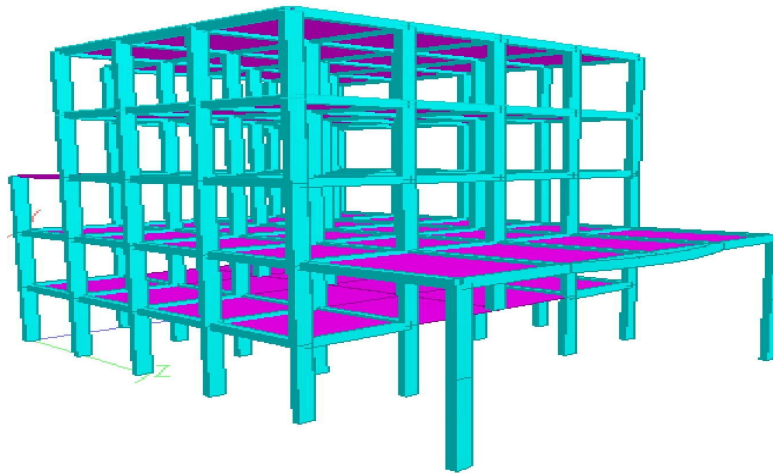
STAAD.Pro model — Existing (as-built) G+4 RC structure (Case A).
